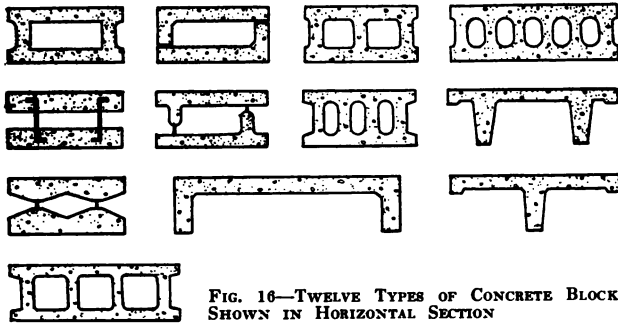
TWELVE TYPES OF CONCRETE BLOCK, SHOWN IN HORIZONTAL SECTION
